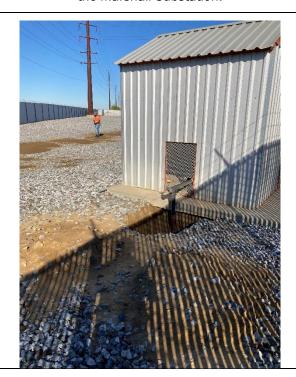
Graded, gravel area within the Marshall Substation (facing west).
